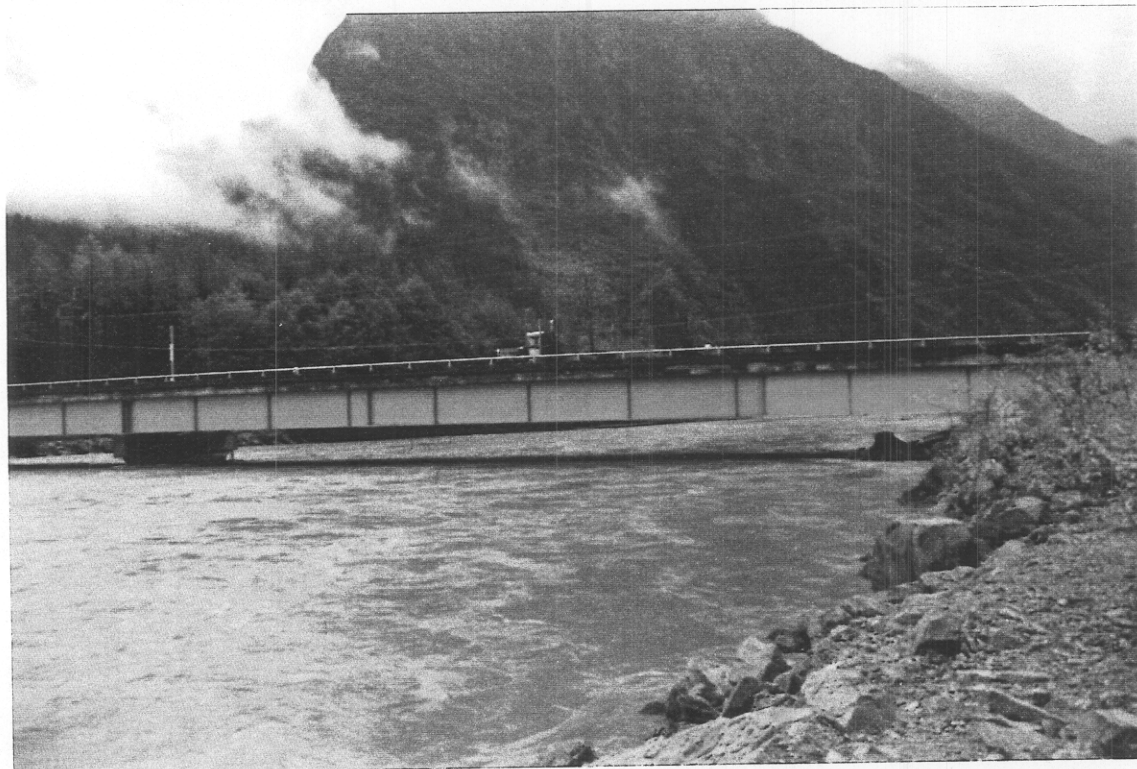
BEAR RIVER BRIDGE LOOKING DOWNSTREAM FROM RIGHT BANK ROCK GROUYNE. BRIDGE GIRDERS ARE 2.18 M DEEP
